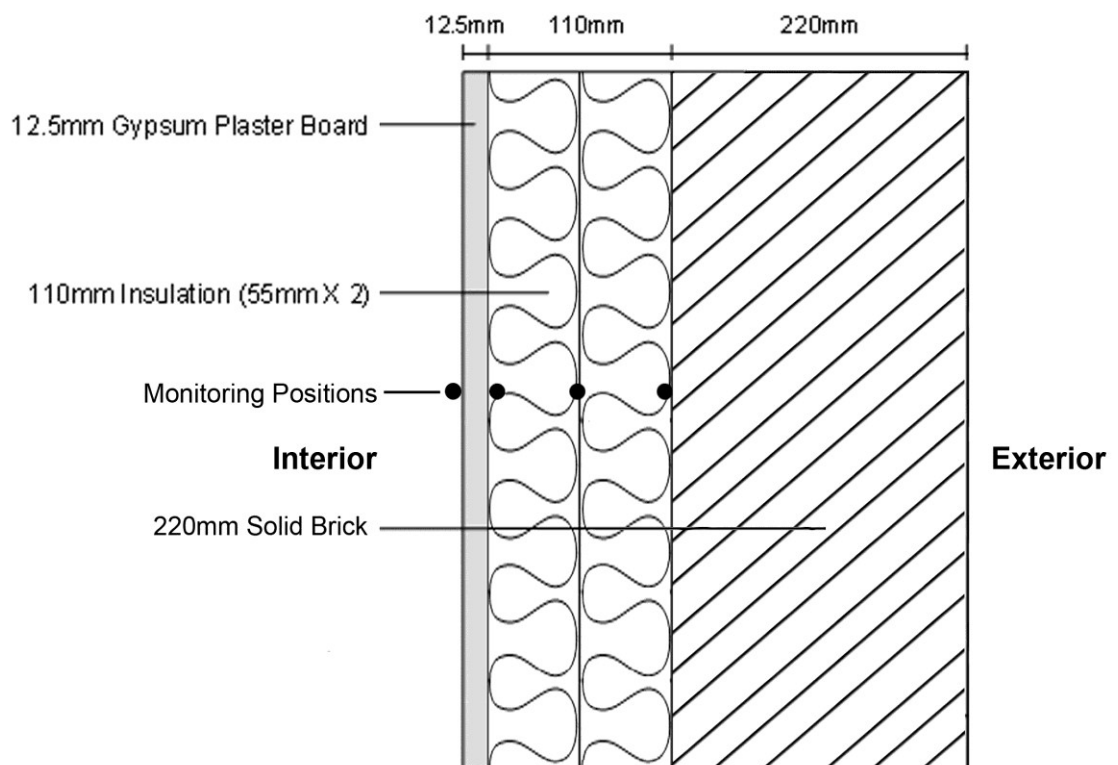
The vertical cross section of the solid brick wall assembly without vapour barrier (wall-3).
